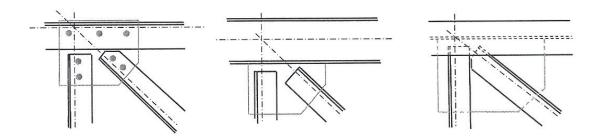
Bolted gusset to T chord (left); welded gusset to H or I chord flange (centre); welded gusset to H or I chord web (right)
